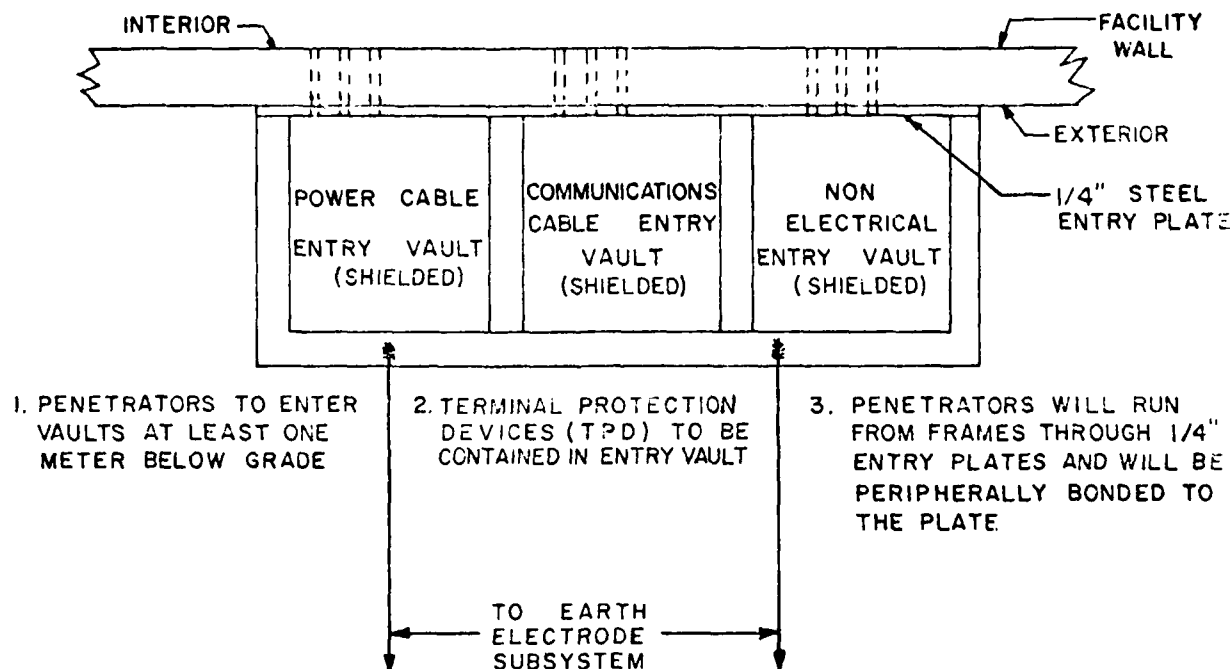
Typical Single Point Entry for Exterior Penetrations (Top View)
